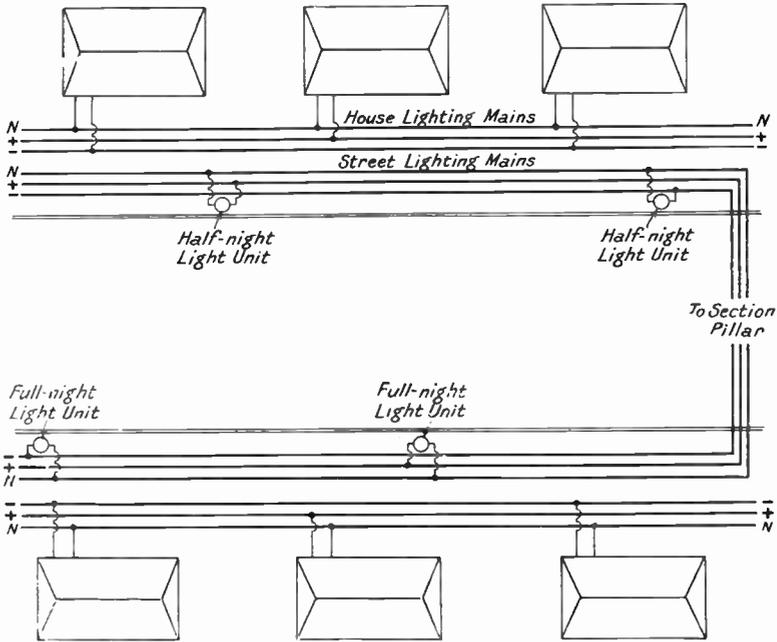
STREET LIGHTING CABLE CONNECTIONS FOR SUBURBAN ROADS.
